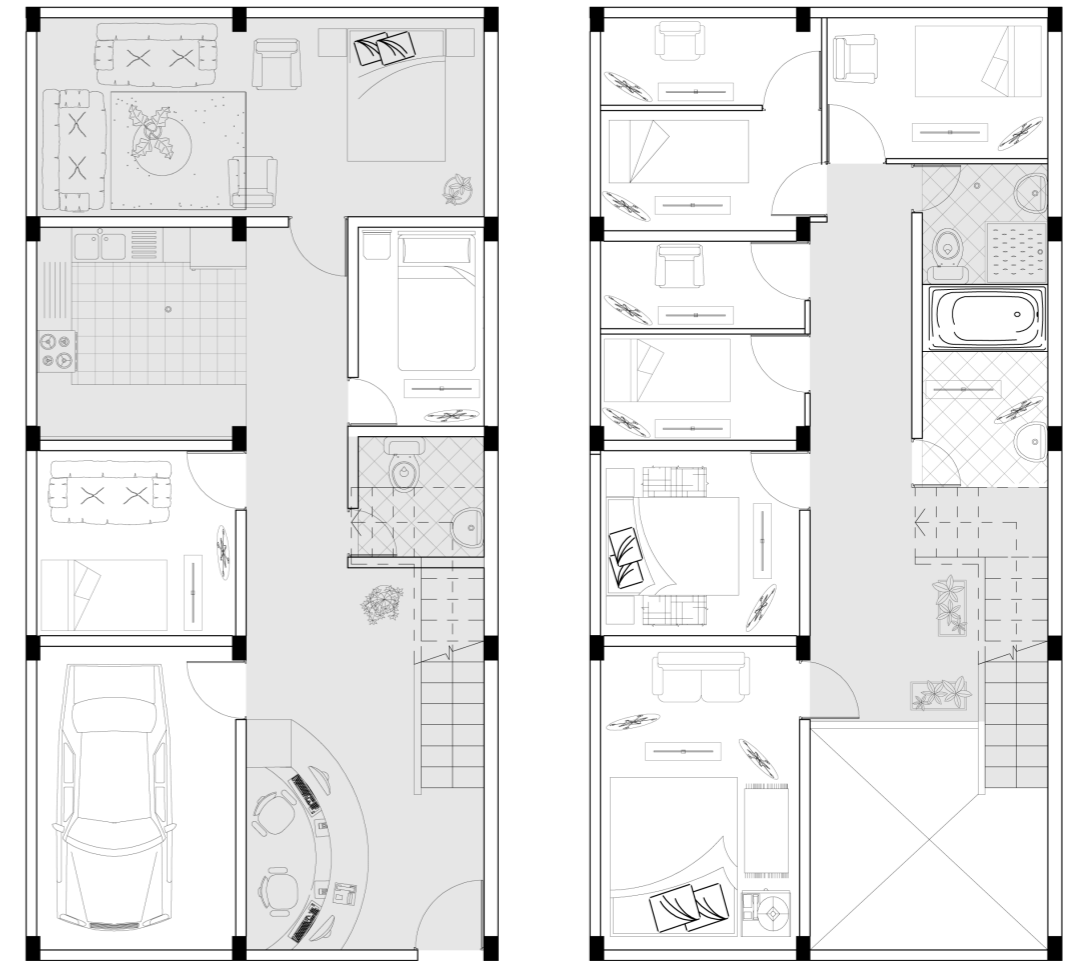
Floorplan of a studio: ground floor and first floor; own representation
